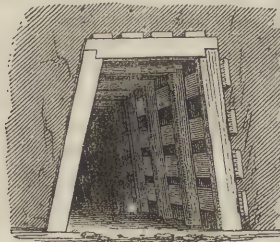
TIMBERS SUPPORTING WALLS OF LORE.
